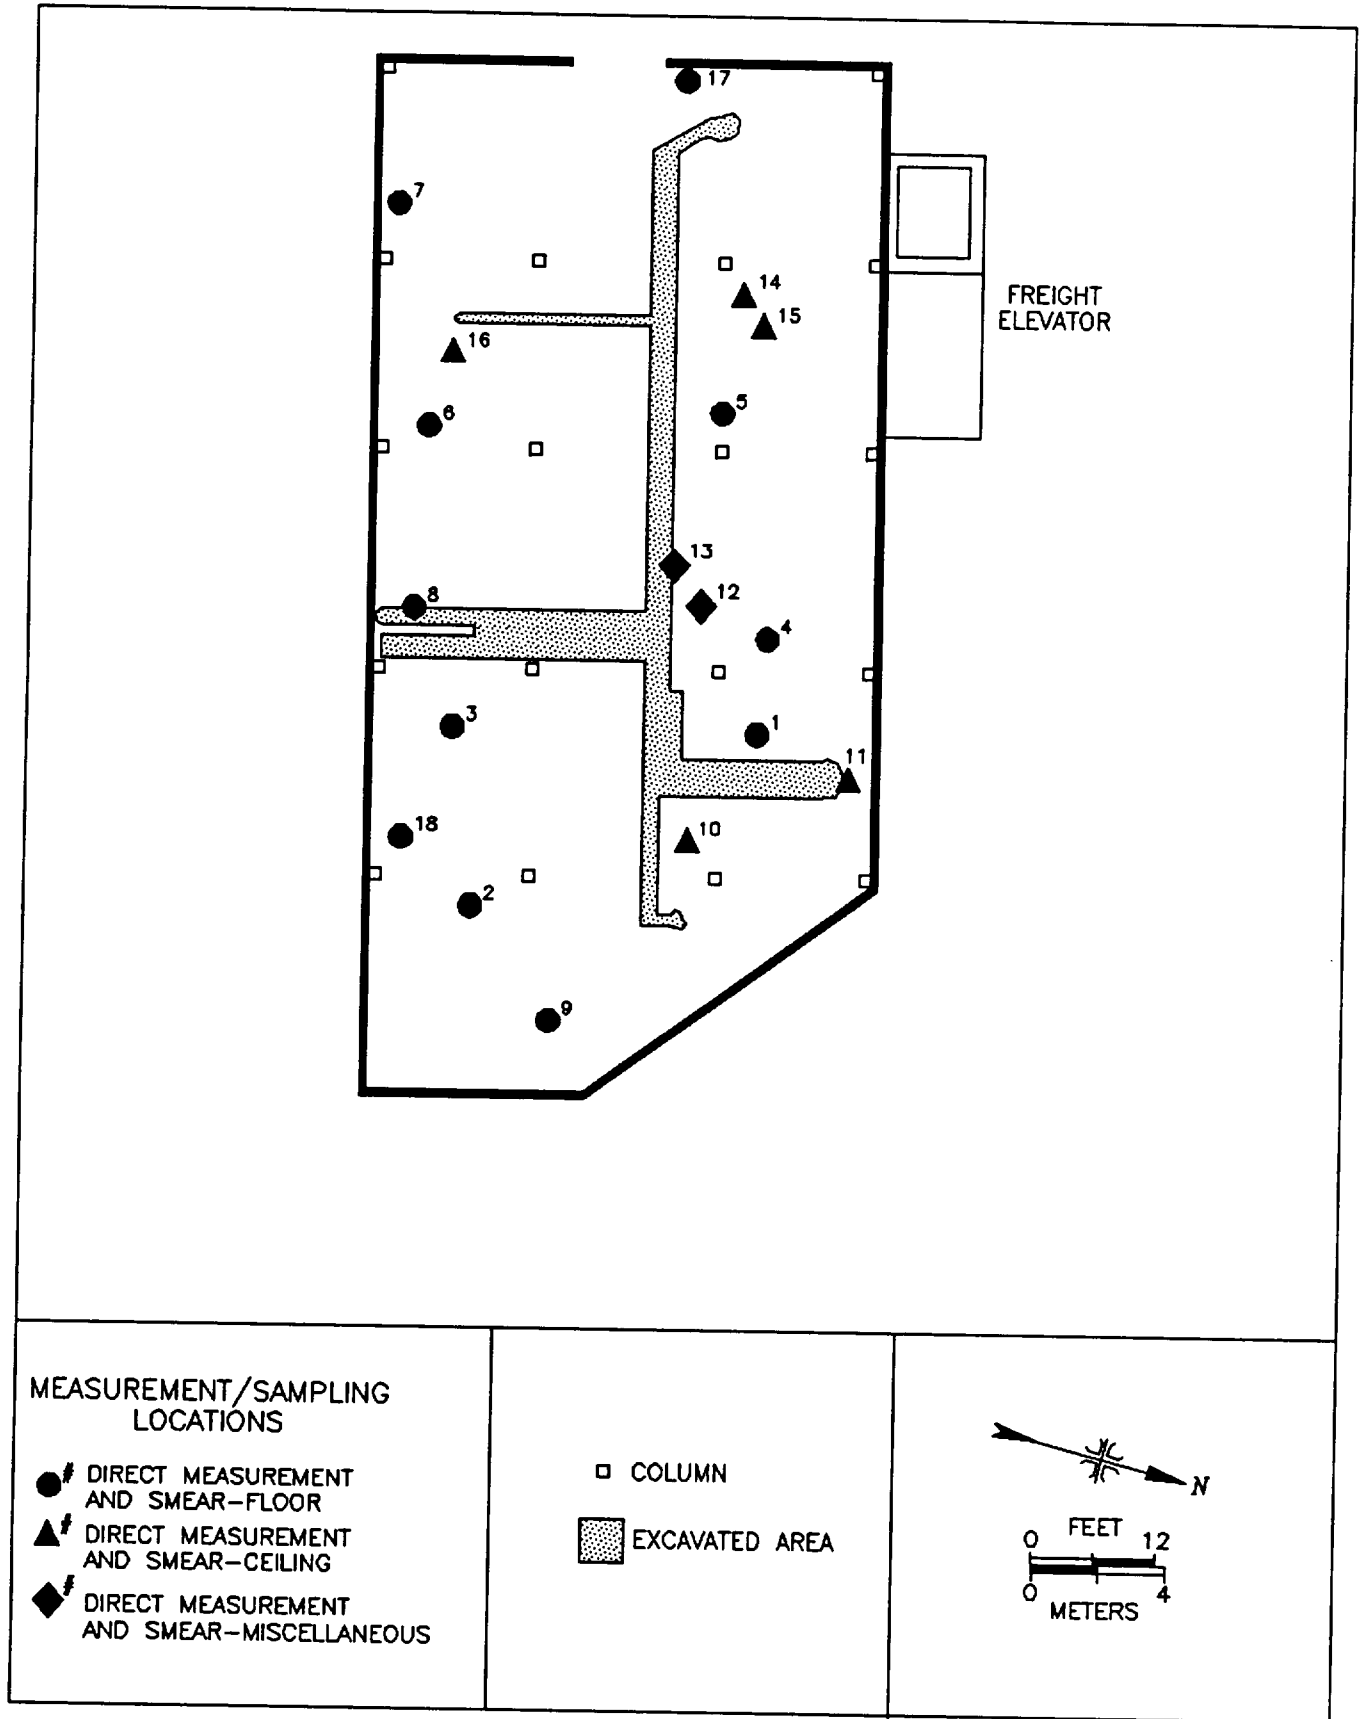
Building 7 Basement – Measurement and Sampling Locations
